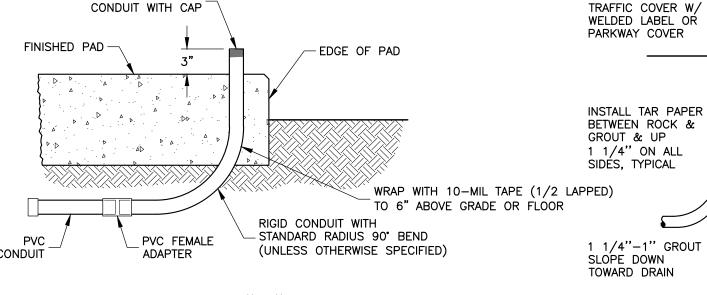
DETAIL "C" CONDUITS STUBBING UP ALONG SIDE ANY OUTDOOR PAD (N.T.S.)
